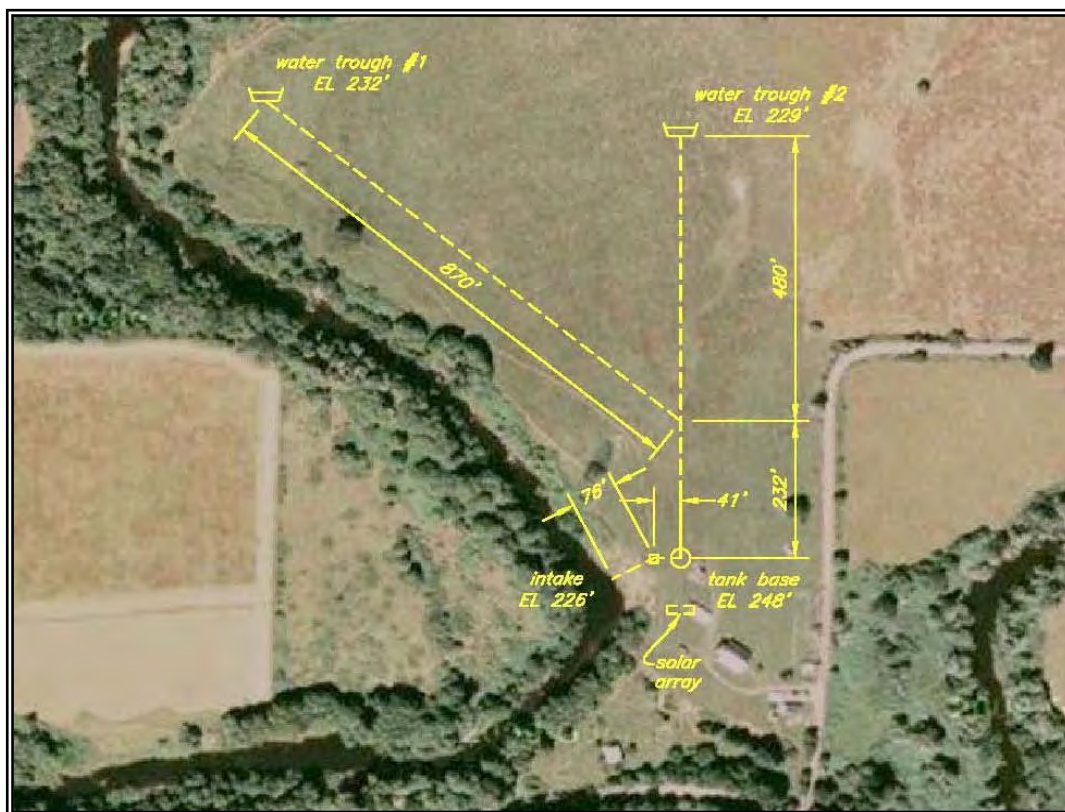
A plan of an example watering system with a storage tank and PV array.
